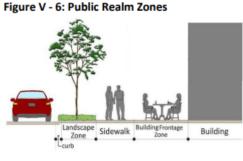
depicts the required configuration of these zones in relation to the street curb and building. The required minimum widths for the
